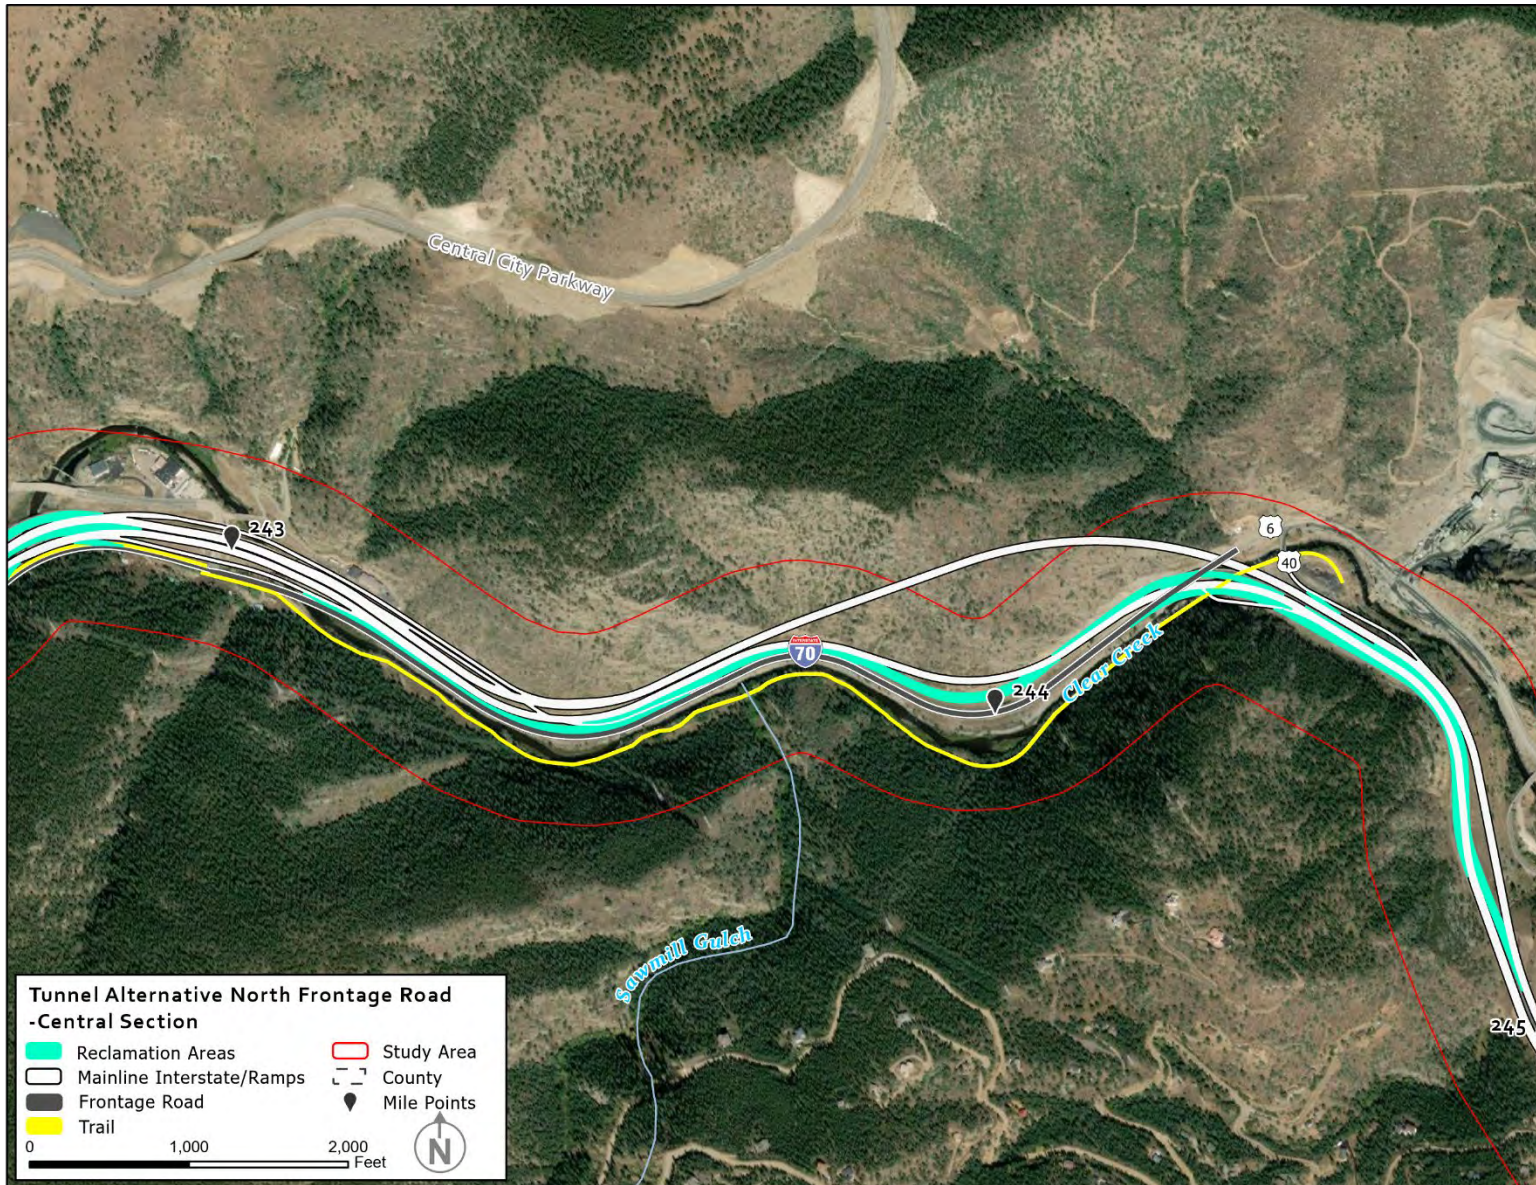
Reclamation Areas, Tunnel Alternative, North Frontage Road Option, Central Section
